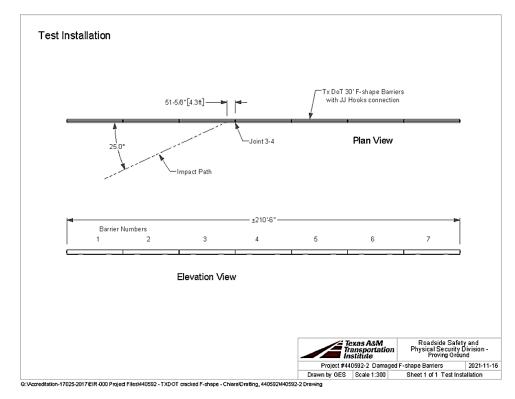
Test Installation Layout for Test No. 440592-2.
